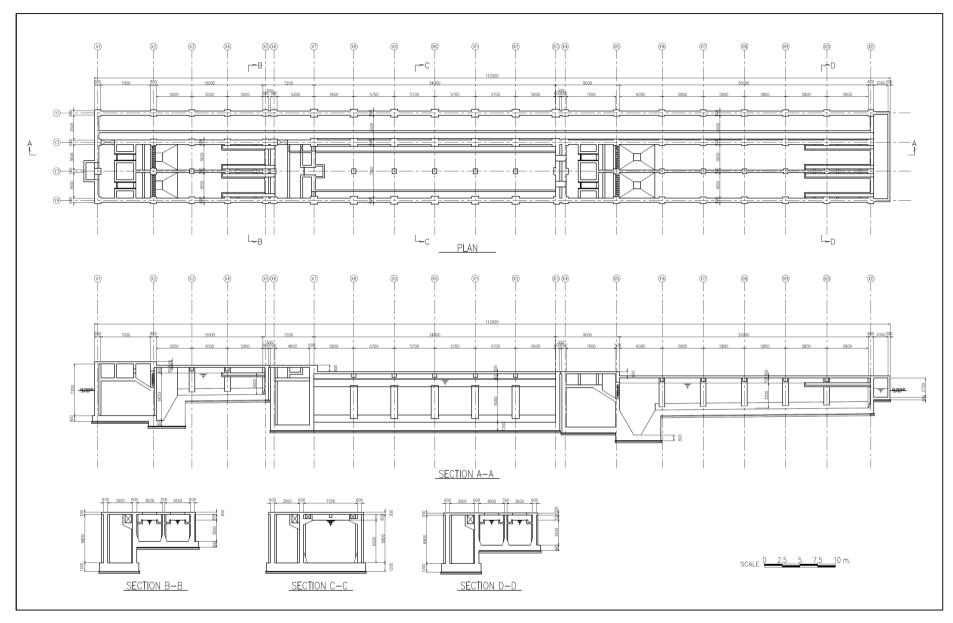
Plan and Section of Major Facilities (1/3)
